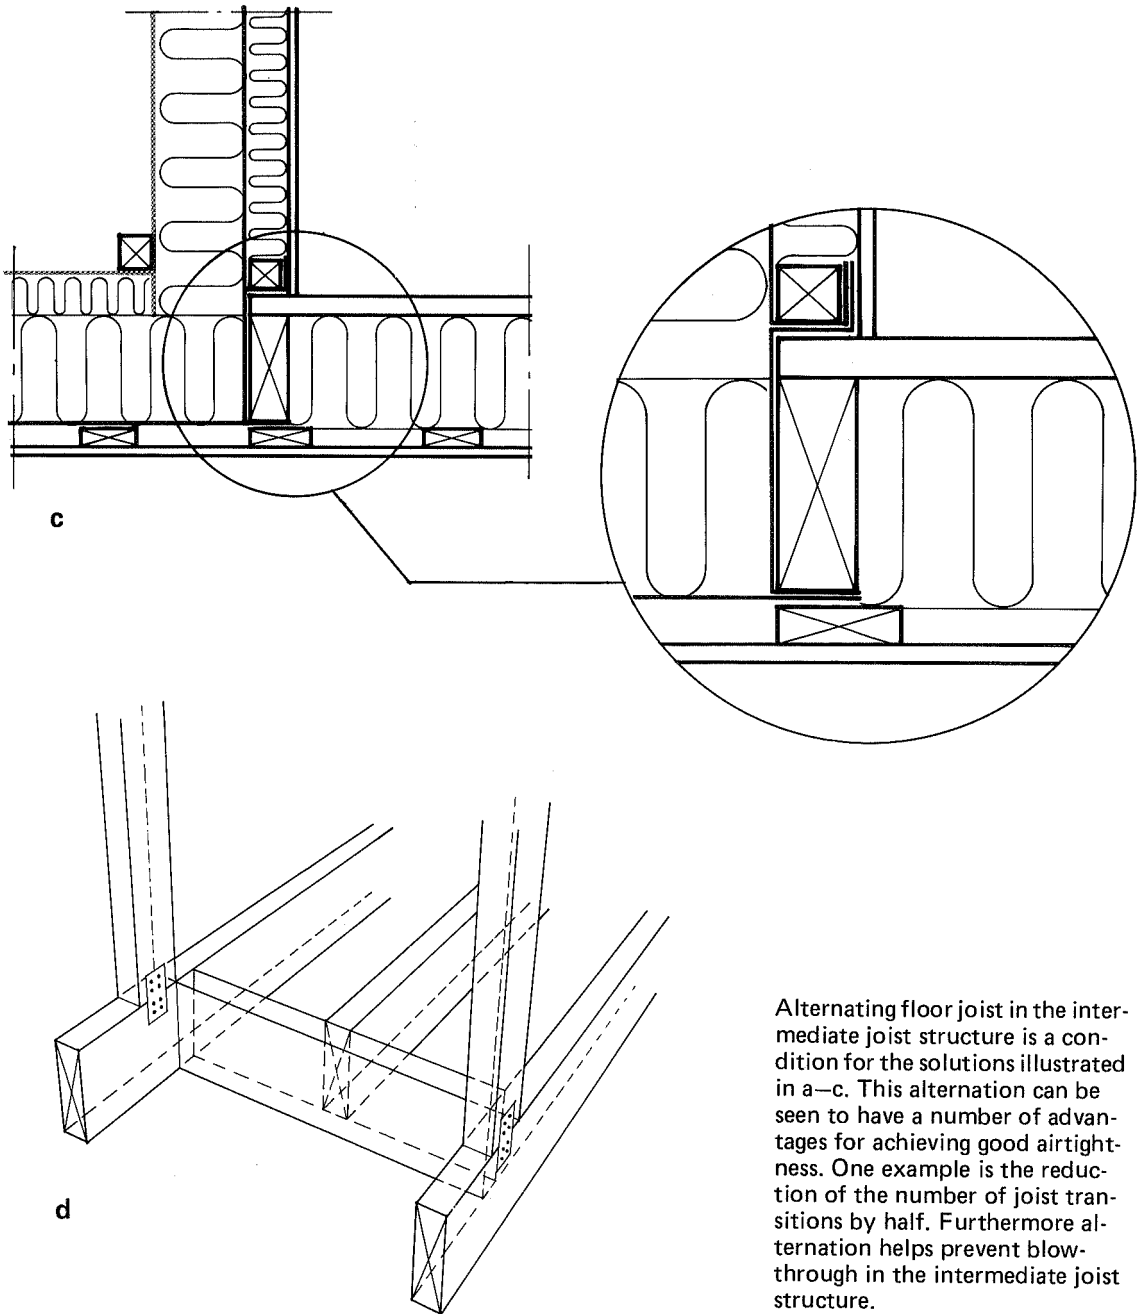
Jointing brace walls and intermediate joist structures in dormer houses. Here the joists have been alternated at the column wall. The number of joists which pass through the sealing layer can be reduced in this way.
